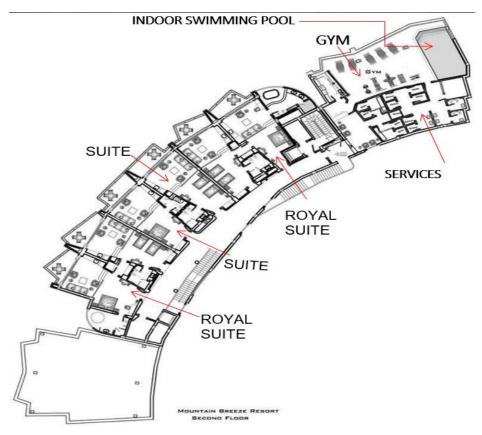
SHOWS THE SECOND FLOOR PLAN
